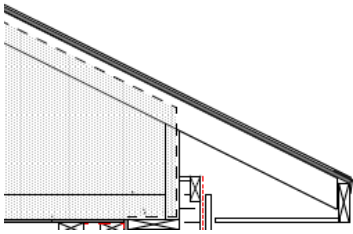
Representation of roof and wall intersection to avoid the thermal bridging.
